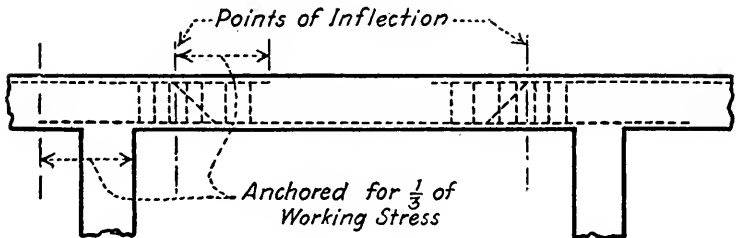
Typical Web Reinforcement for Continuous Beams With Special Anchorages
